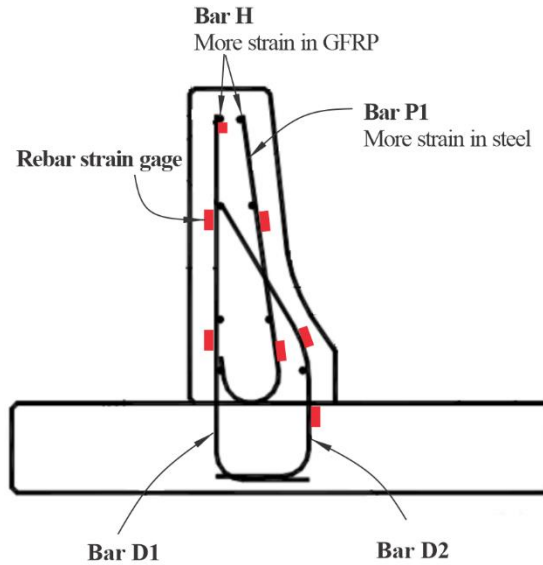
PL-2 barrier reinforcement layout (El-Salakawy et al. 2001)
